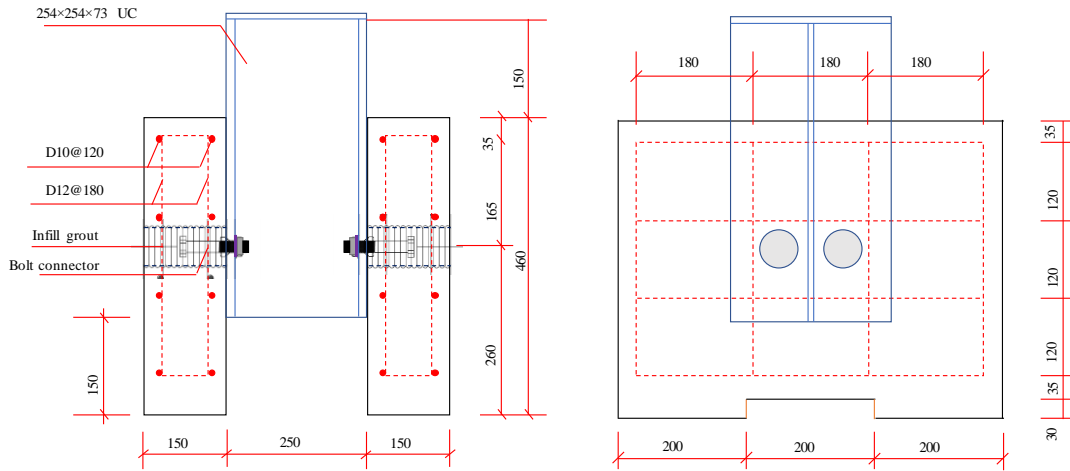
Geometric configuration of push-out test specimens (unit: mm)
